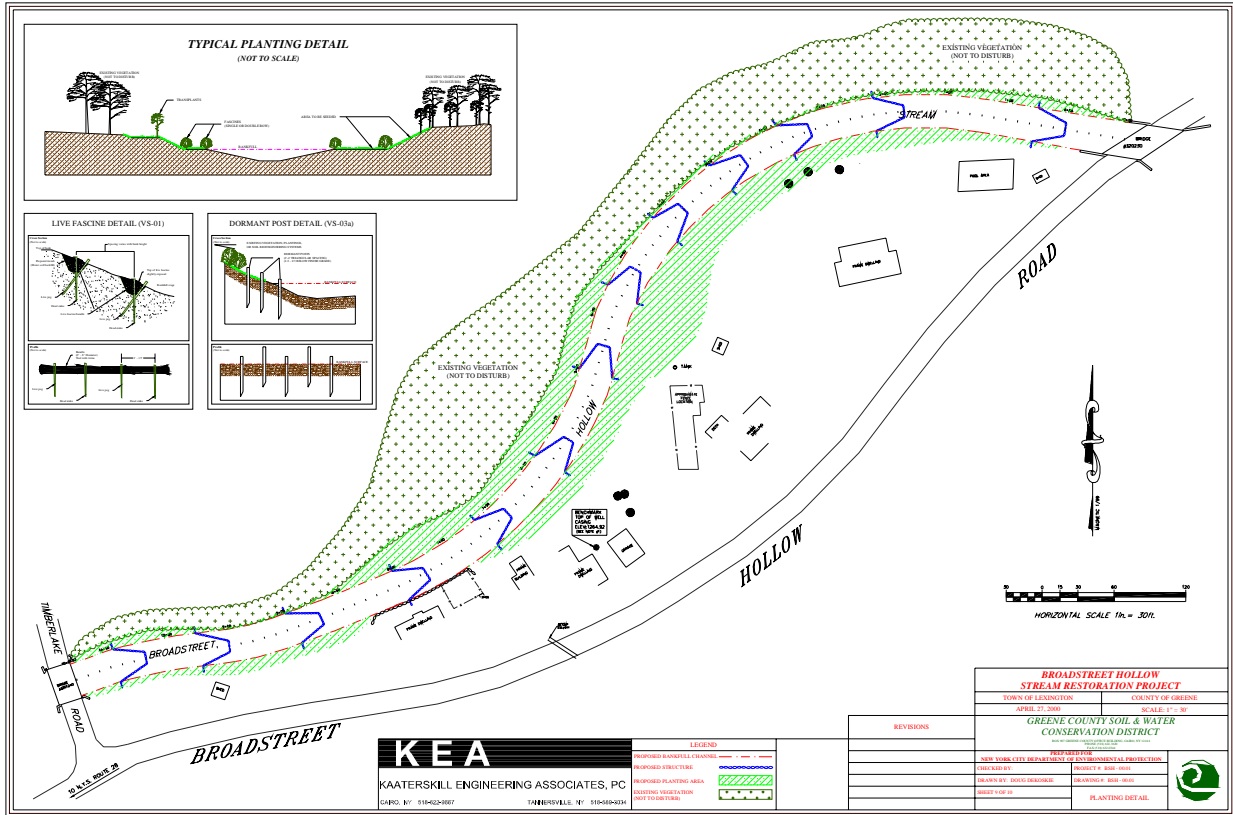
Design plan drawings for demonstration stream stability restoration project for MU3, 2000, showing vegetative planting (bioengineering) plan and spacing of rock vane structures. Drawing courtesy of Greene County Soil and Water Conservation District, NY.
